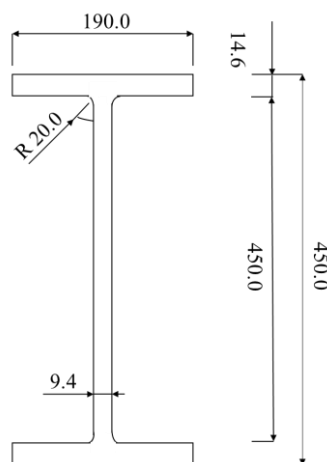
IPE450, cross-section geometric dimensions (mm).
